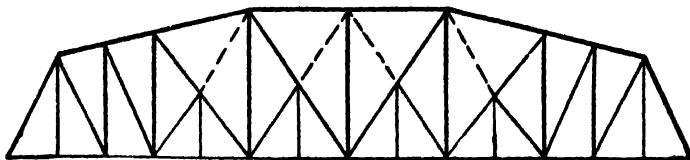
f. Camel-back Truss with Subdivided Panels.
